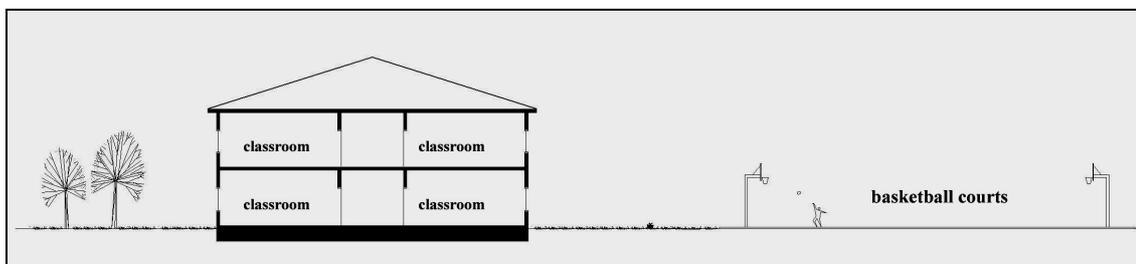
Section of the elementary school building (Building C) of Deniz ES.
